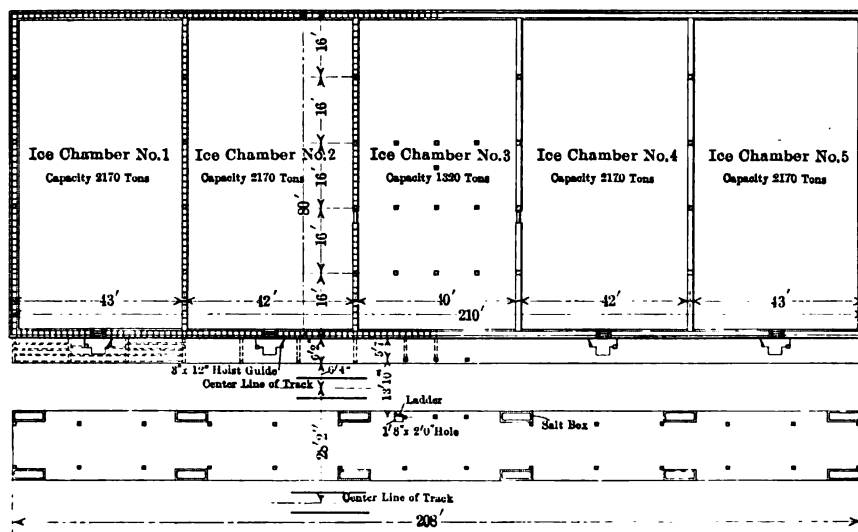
General plan, icing station, Hawthorne—Chicago, Burlington & Quincy.
